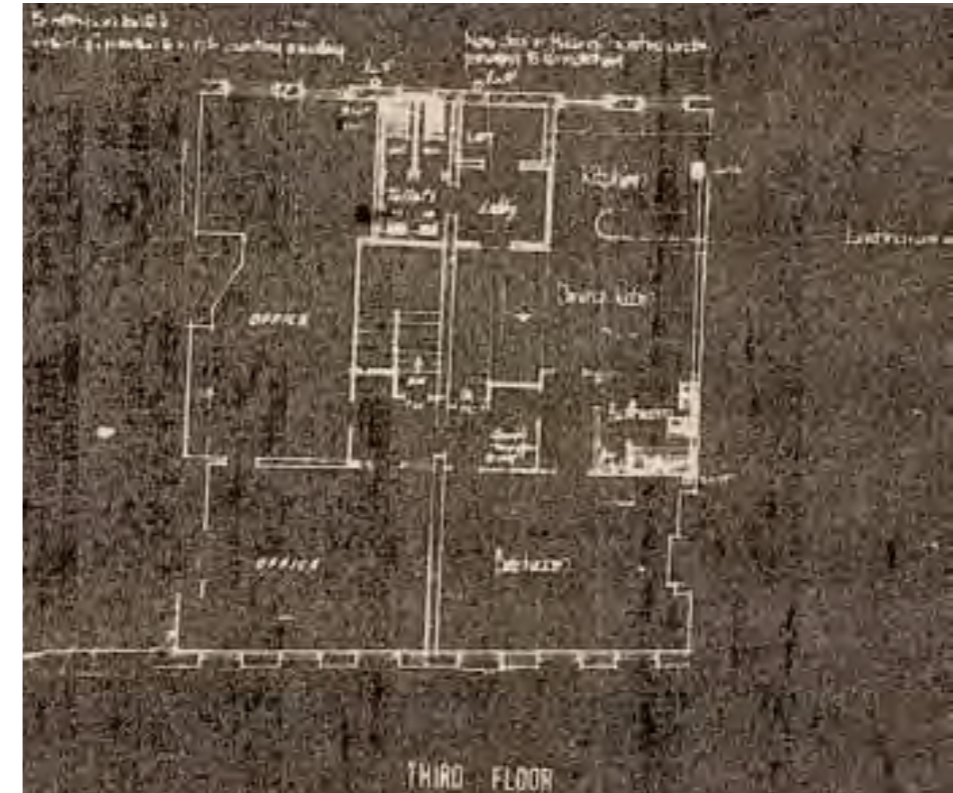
APRIL 1965 DRAWING FOR NOS. 14 AND 15 GREAT JAMES STREET, THIRD FLOOR (SOURCE: CAMDEN LOCAL STUDIES LIBRARY AND ARCHIVE).
